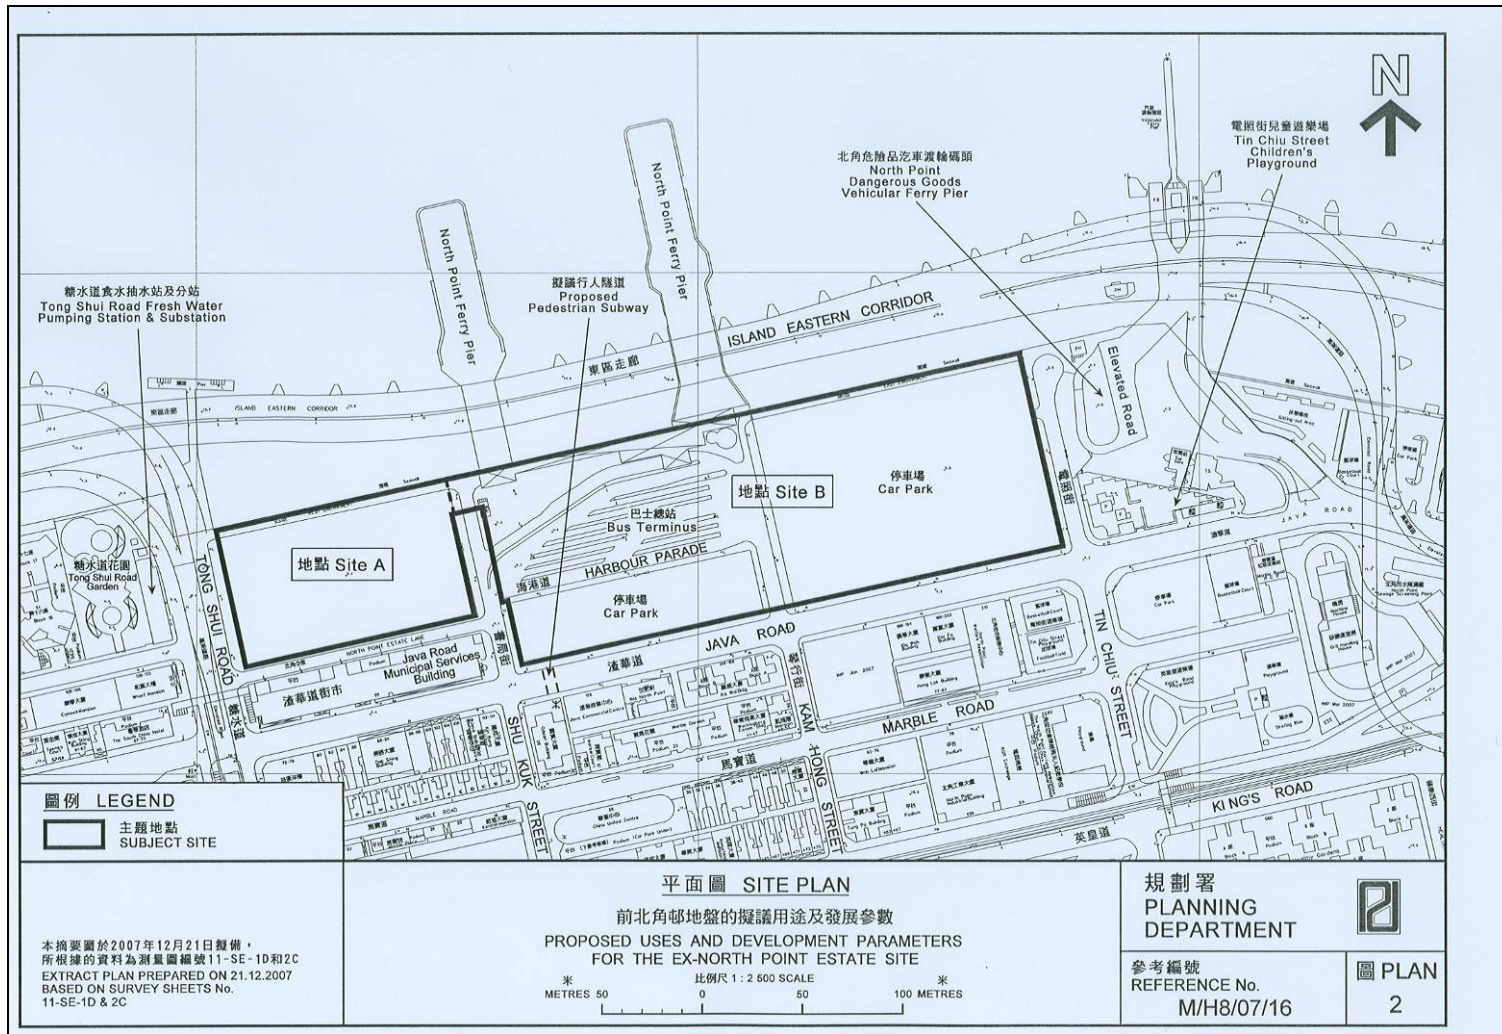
Site Plan for the Project Area of the Ex-North Point Estate Site
